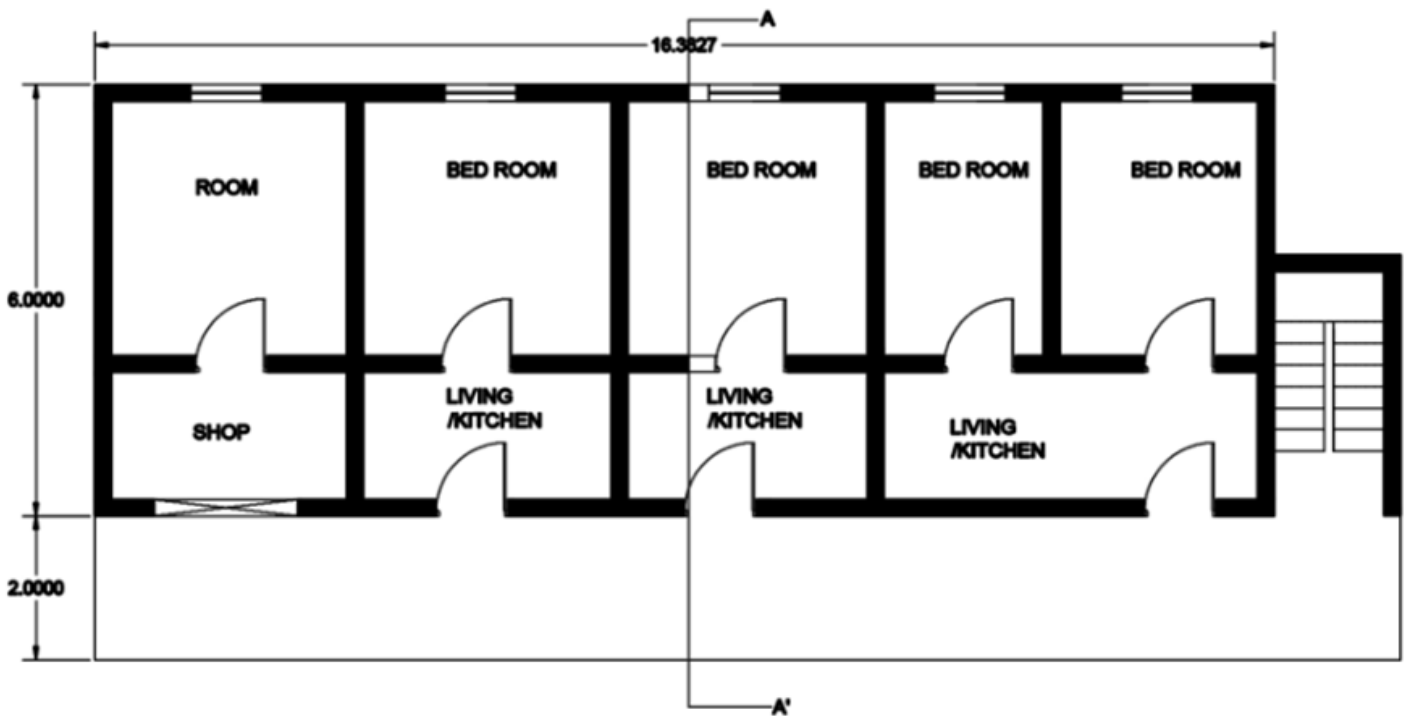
TYPOLOGY – 3 (G.F PLAN)
